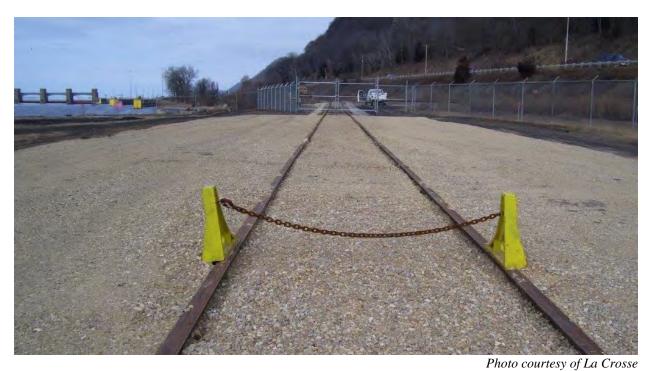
On-site Rail Spur at Northern End of La Crosse Site (2013)
